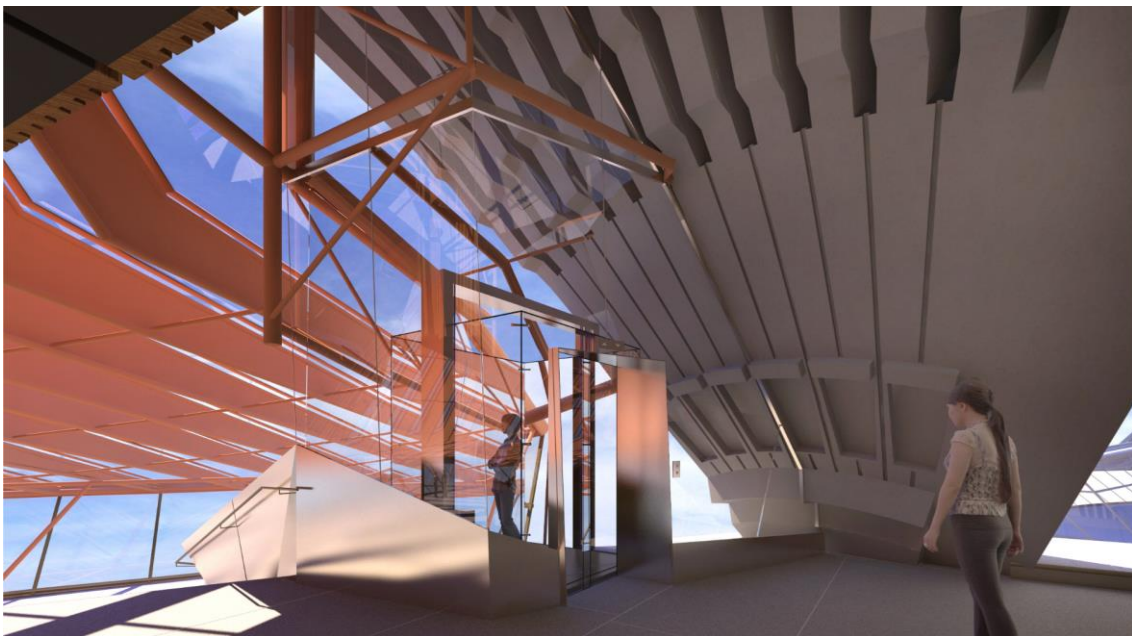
Proposed Lift 30 Level 4 (Source: ARM Architecture)
